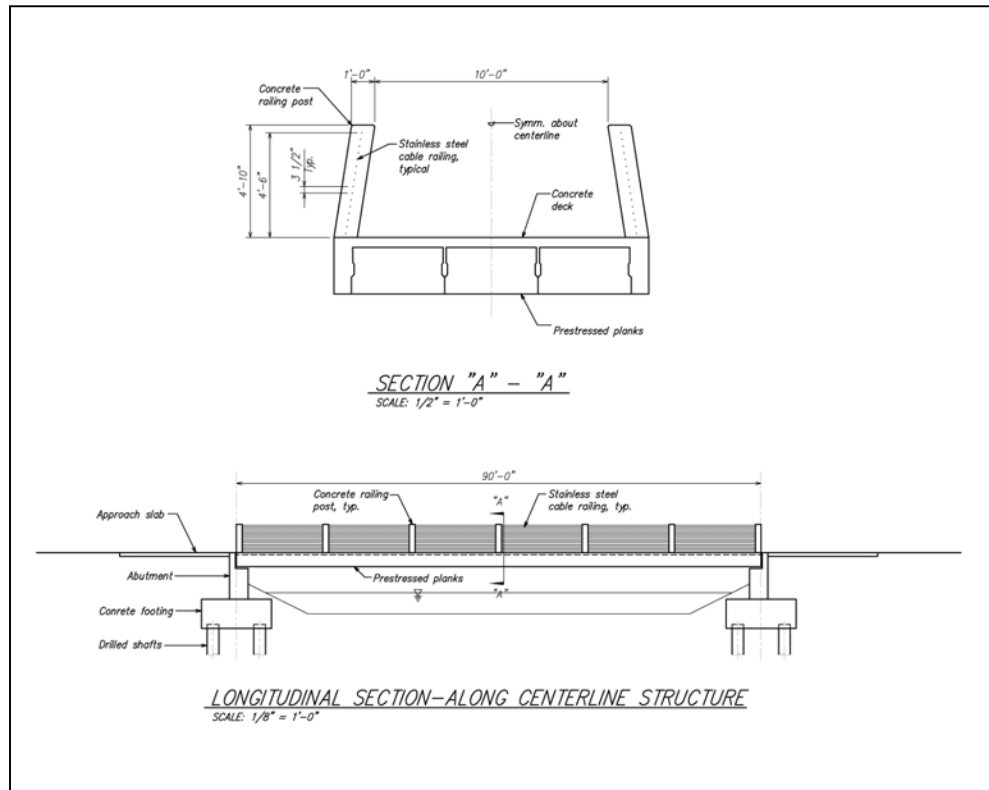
Proposed bridge, Option 1 – Pre-stressed Planks
